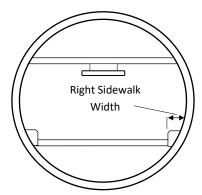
Sidewalk Width Looking in the Direction of Inventory
